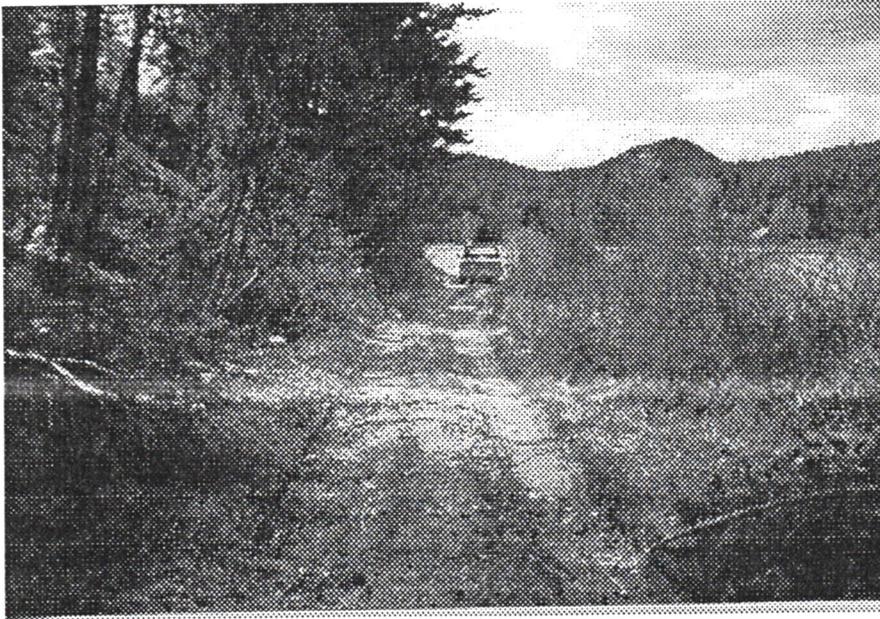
Access road in 1996 prior to any construction. (Photo by Dale Pier FWP)
